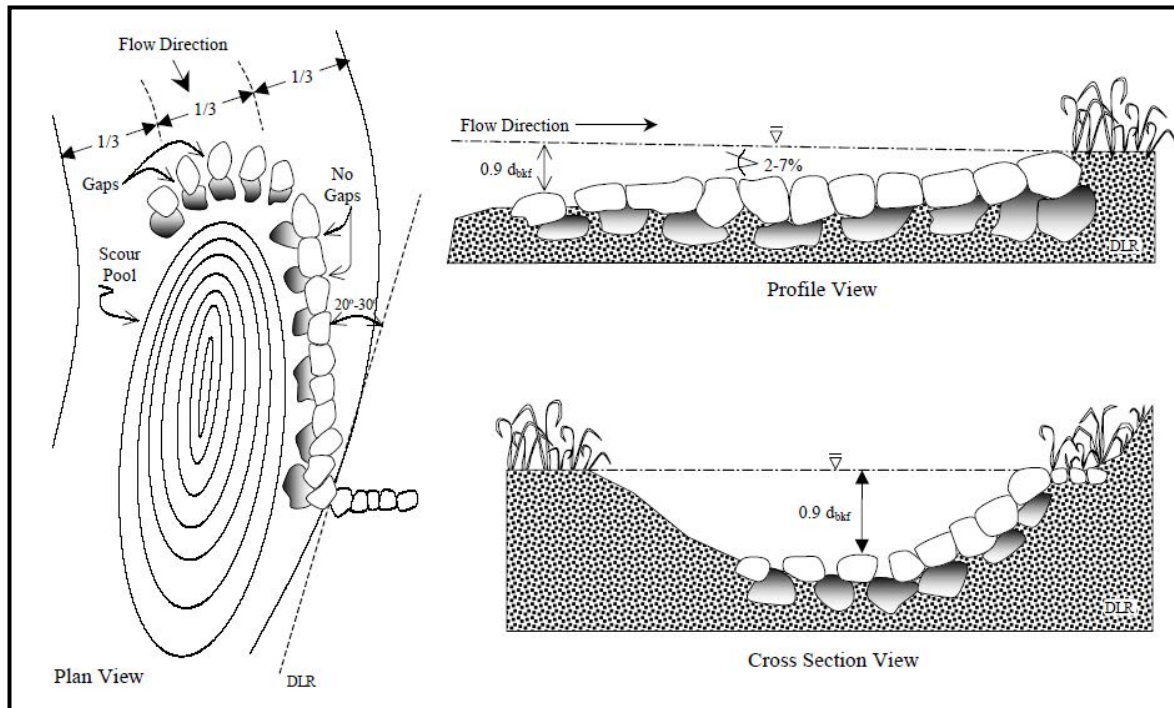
J-hook vane plan (map) view, cross-section view, and river longitudinal profile view (Rosgen, 2006).
